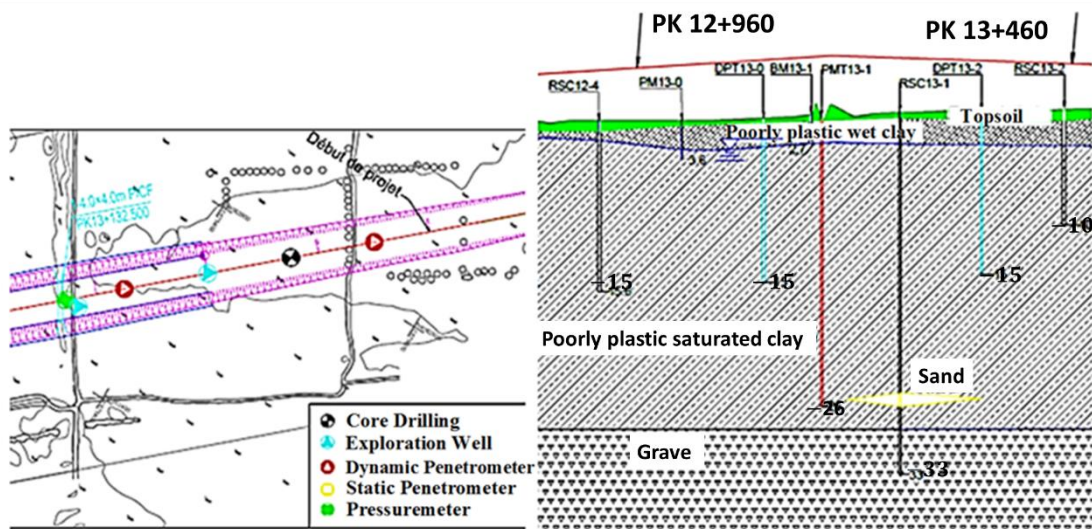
Plan projection (left) and longitudinal profile (right) for conducted tests at PK13+000
